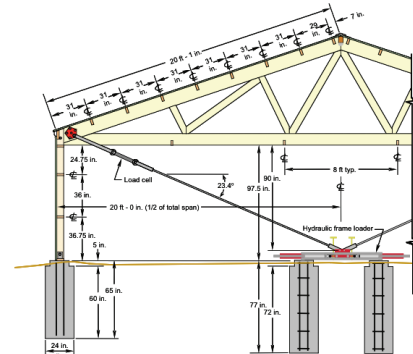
Cross-section of interior post-frame with hydraulic frame loader.
